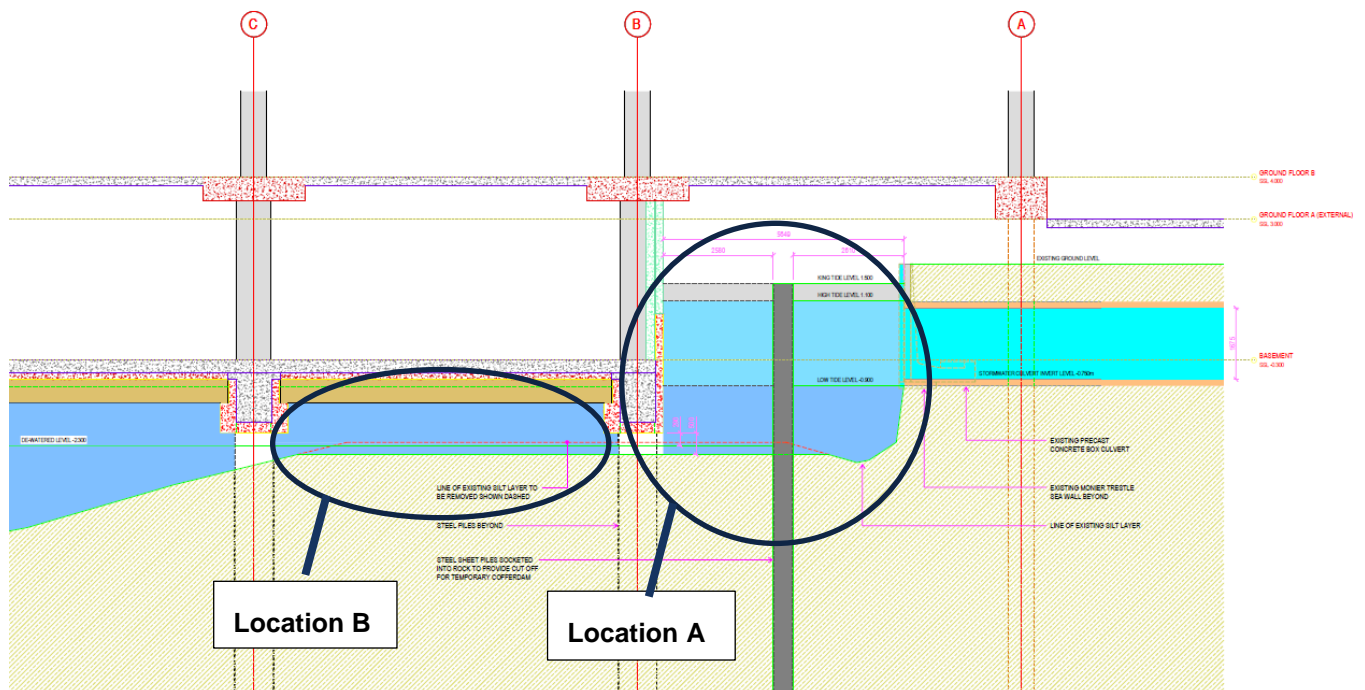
Cross Section for Stormwater Culvert 2 (Central)
